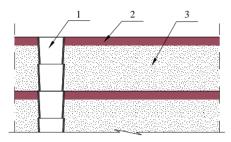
Old dewatering facilities in stope 1—drainage tower, 2—hard floor, 3— filling body
